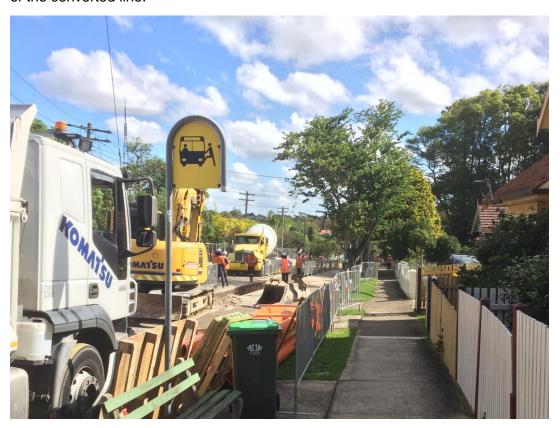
33 kV Underground Feeder Powerline works at Hercules Street intersection
